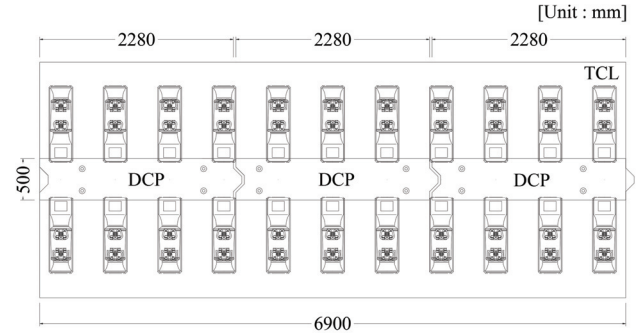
Segment with 6.9 m Length for Concrete Slab and DCP
